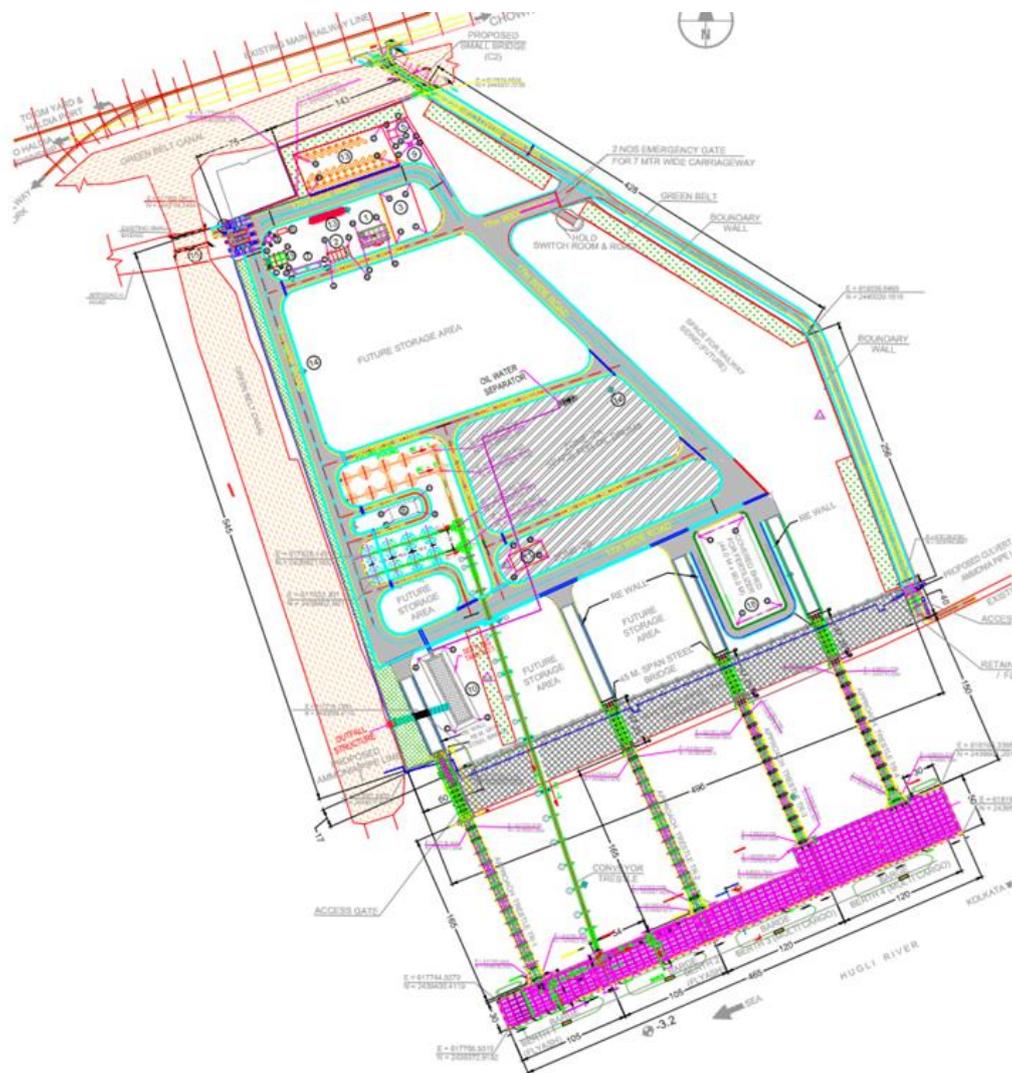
Haldia MMT - Layout Plan of Terminal Facilities
